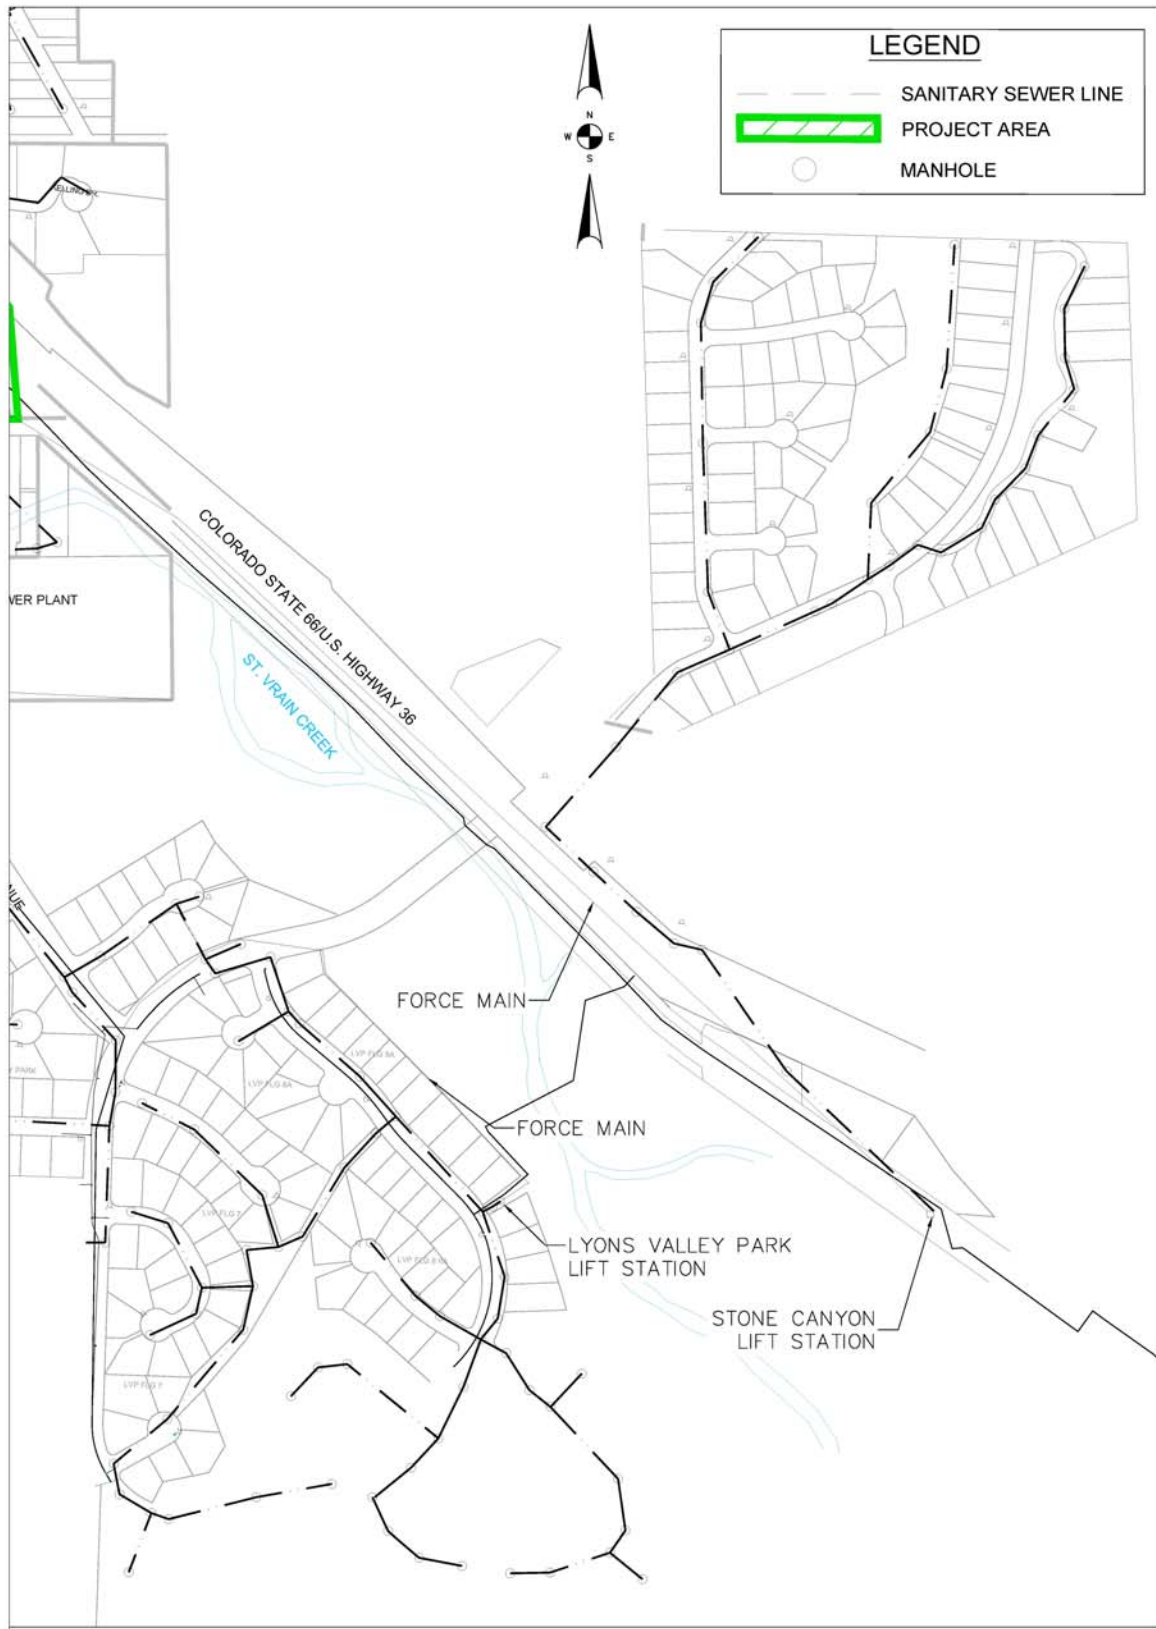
Stone Canyon Area: No Wastewater Capital Improvement Projects Planned
